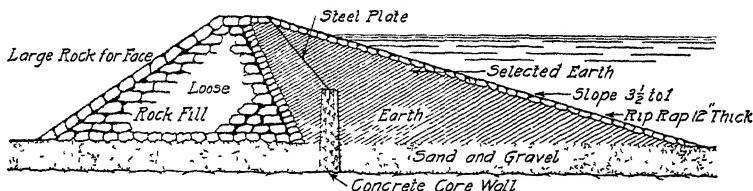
Section of Avalon Dam, Carlsbad Project, New Mexico
